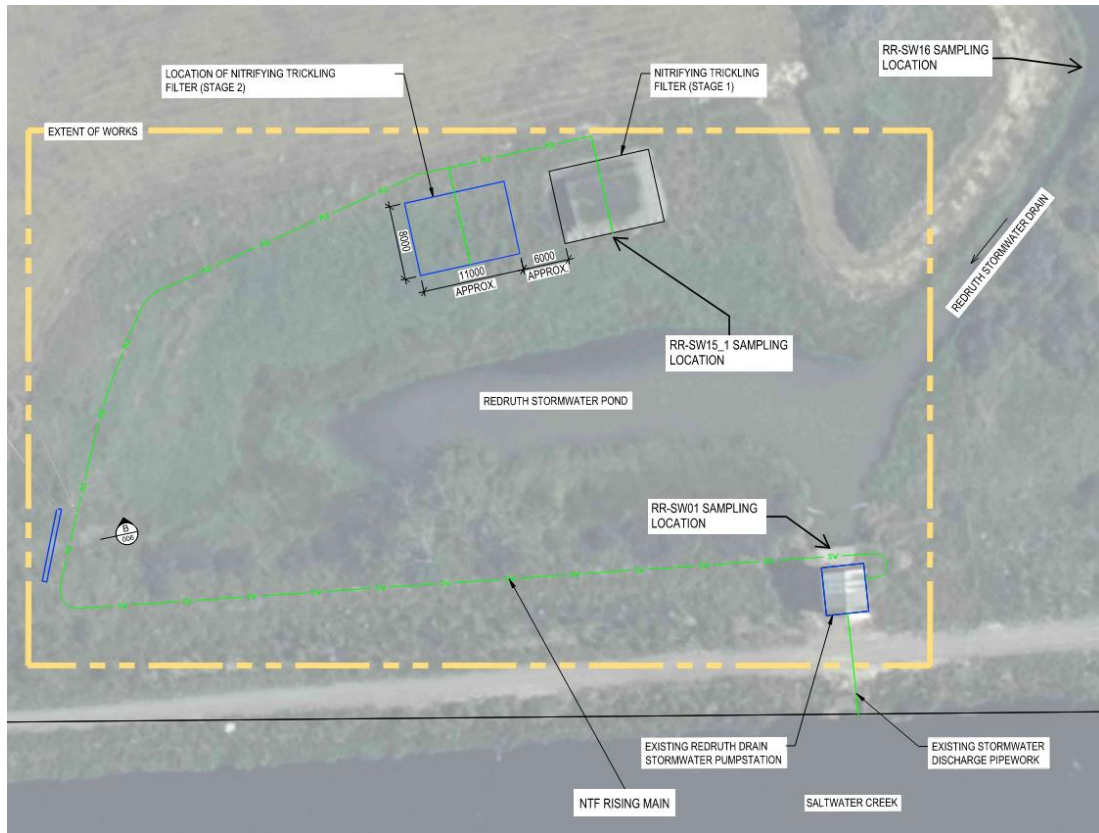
Redruth Stormwater Pond and NTF site showing NTF monitoring locations.
